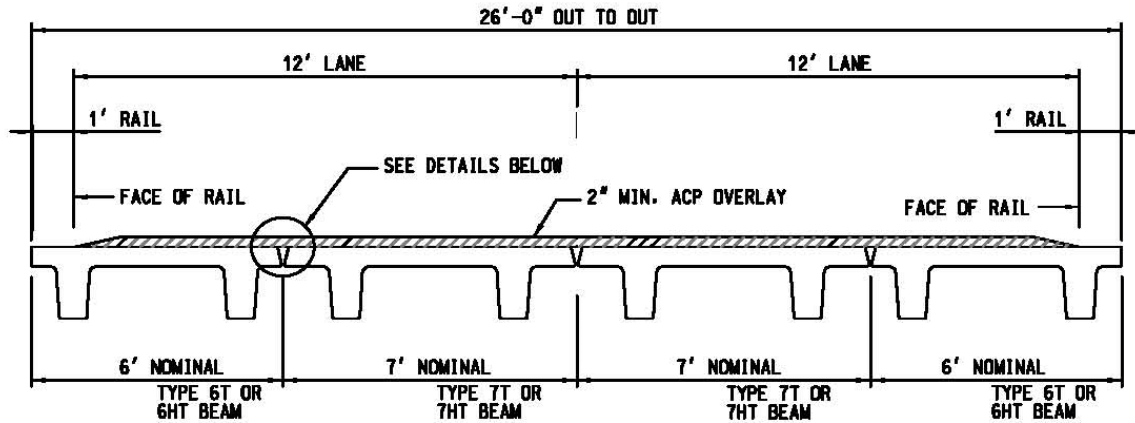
A typical double-tee bridge section (FHWA, 2013a)
